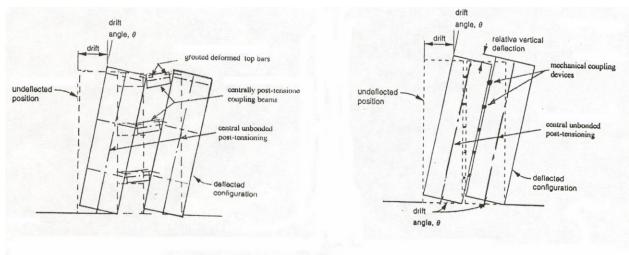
(a) Coupled wall test module with coupling beams.
